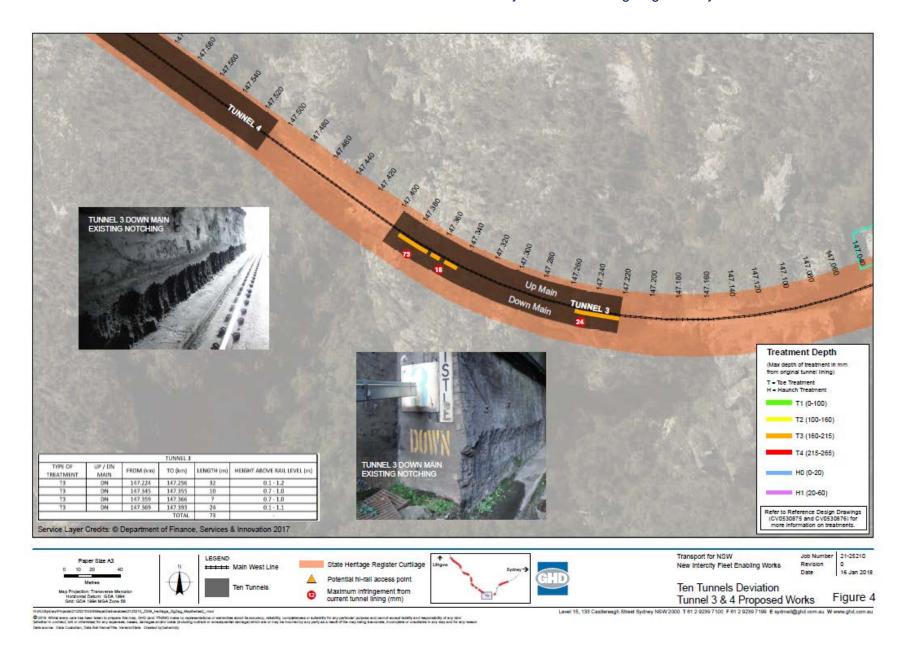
Proposed treatment overview for Tunnel 3 and Tunnel 4 (GHD Great Zig Zag Railway deviation tunnels Heritage Design Summary 2018)
